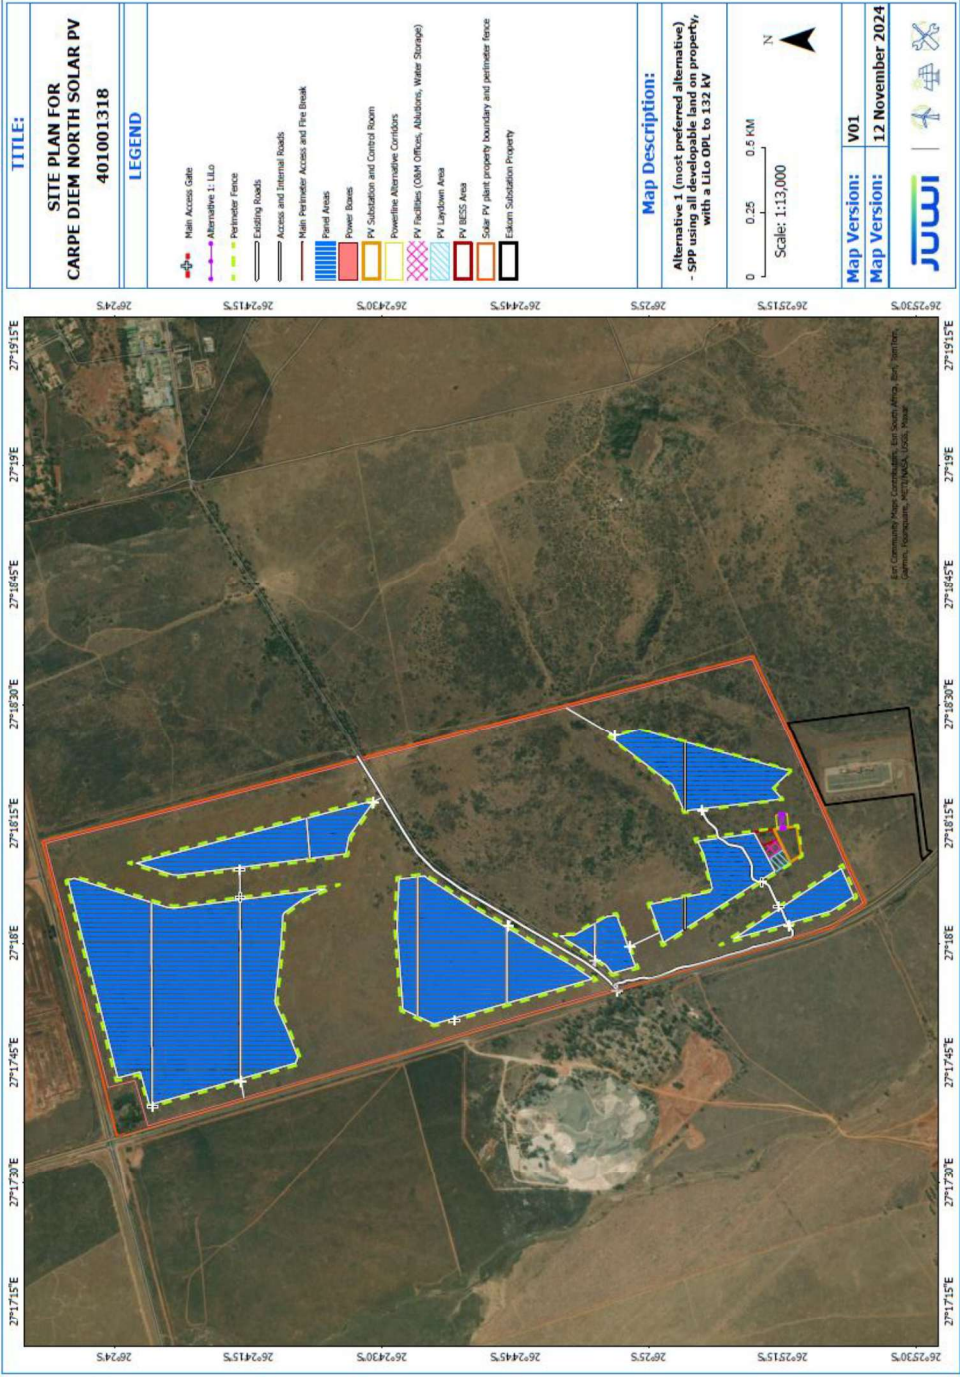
Detailed site layout map of the proposed Carpe Diem North SPP – Alternative 1 layout, the most preferred alternative, with a Loop-In-Loop-Out (LiLo) Overhead Power Line (OPL) connection to the existing Eskom 132 kV OPL.
